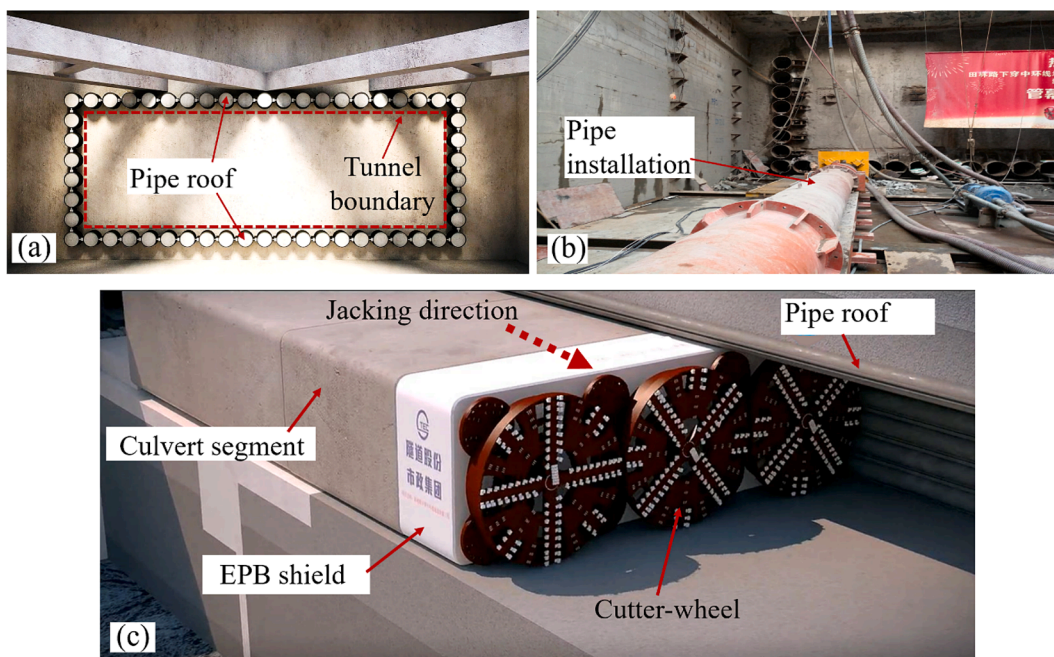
Schematic of work procedure:(a) Pipe roof boundary;(b) pipe roof installation and (c) EPB culvert jacking.
